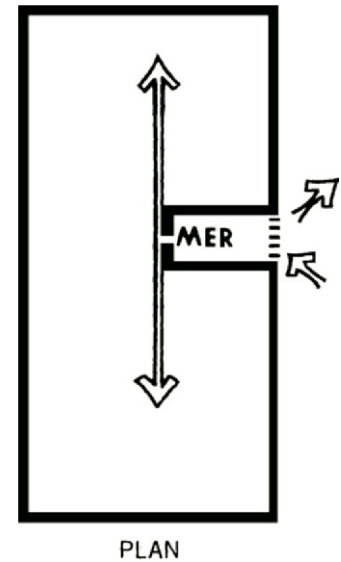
Usually, the mechanical equipment rooms (MERs) should be centrally located and have access to the outdoors.
